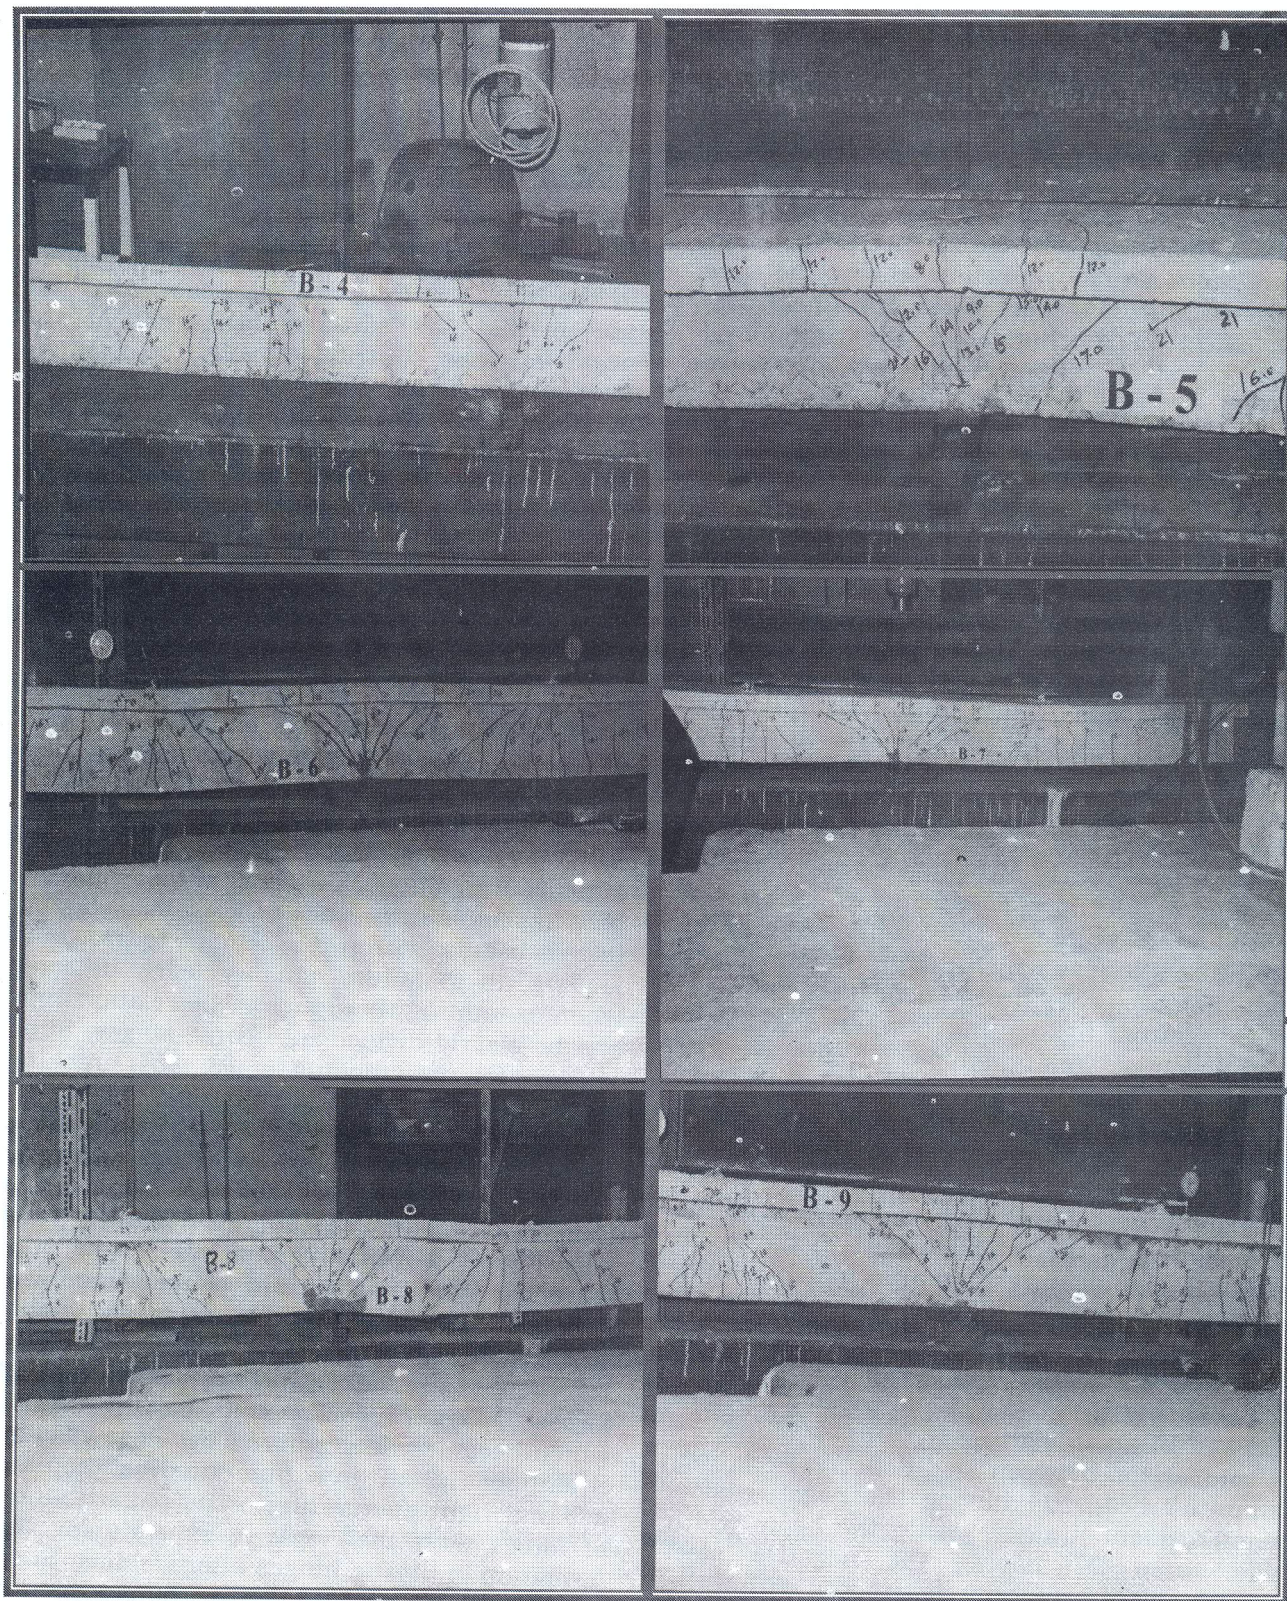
Cracking patterns of tested beams having T-cross-sections after failure.
